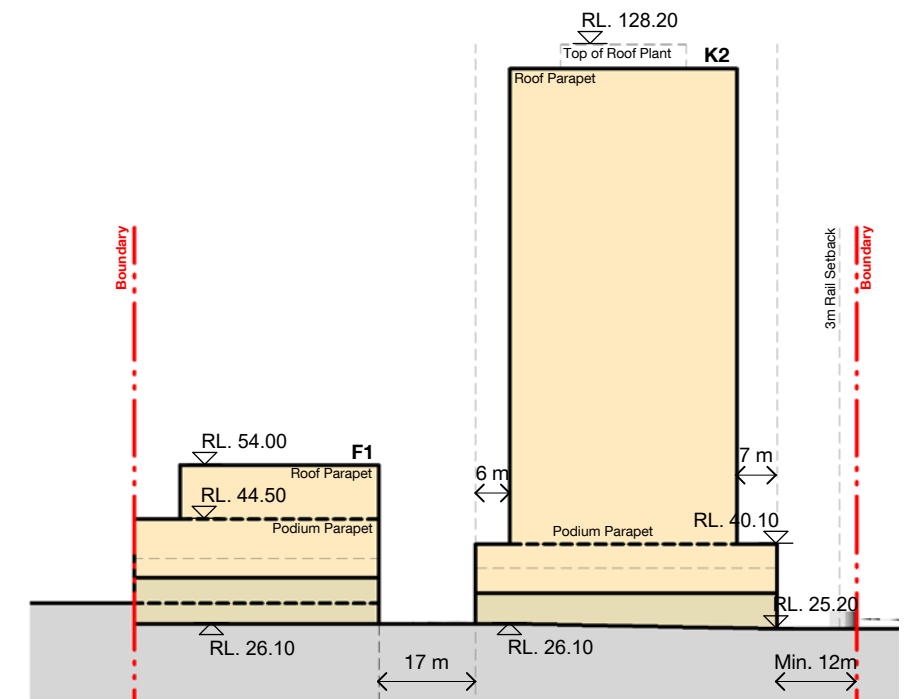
Building envelopes section diagram through F1 & K2
